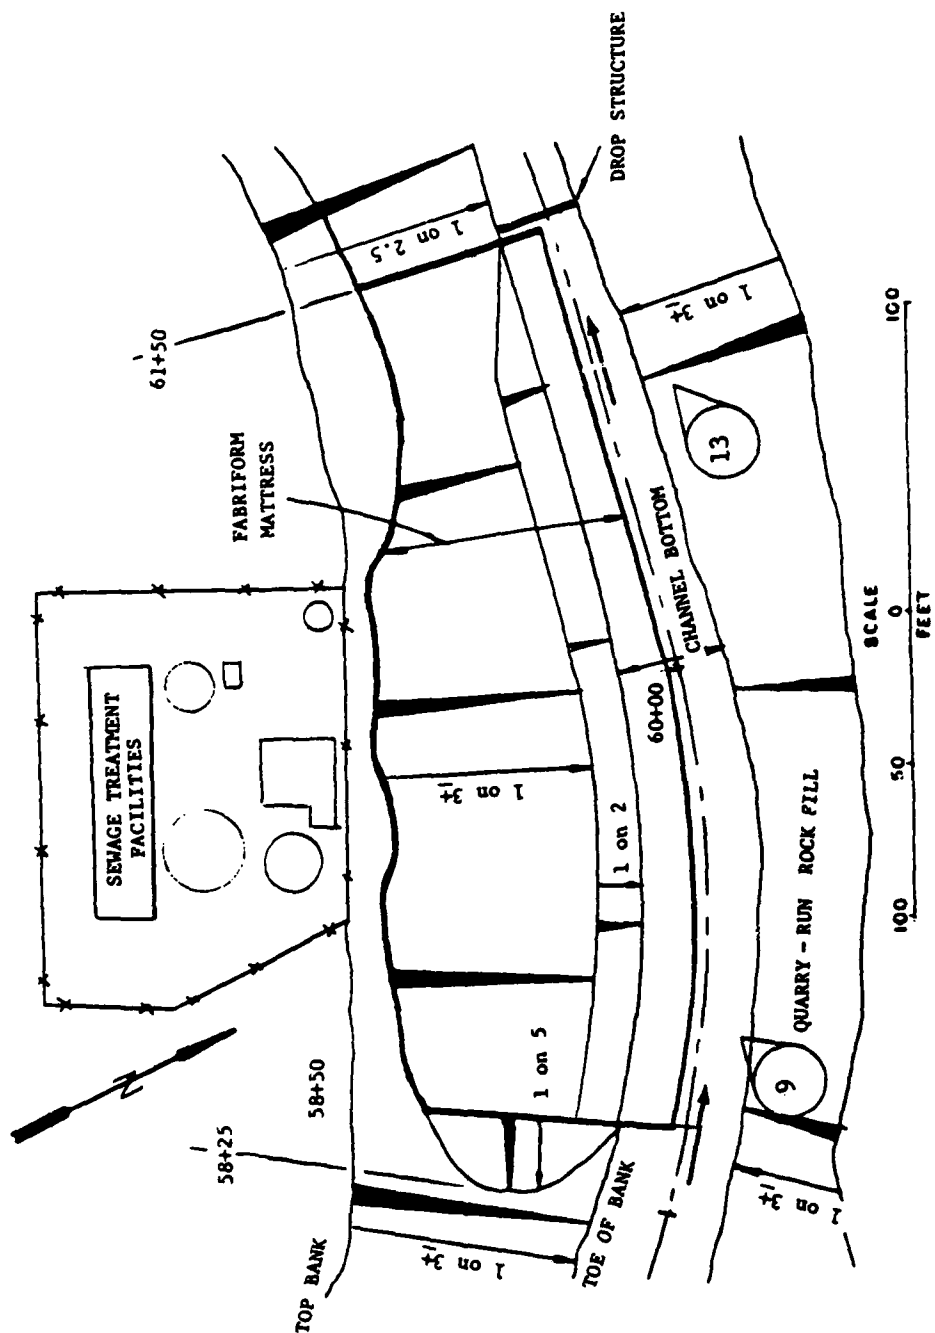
102 River (East Fork) at Bedford, Iowa. Plan view of Fabriform revetment at Bedford Sewage Treatment Plant (sta 60+00). Orientation of field-of-view and location from which photograph was taken are represented by  for Figures 9 and 13.
